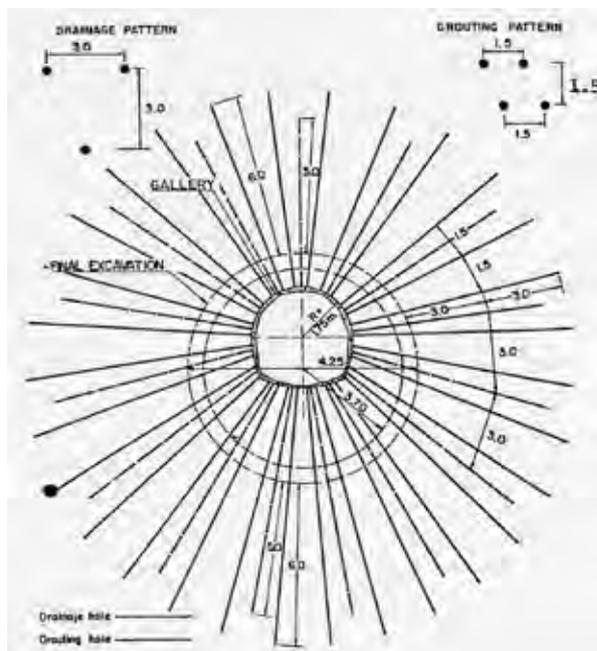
Pattern for the radial grouting and drainage for enlargement of the pilot tunnel of the Guavio tailrace tunnel.
